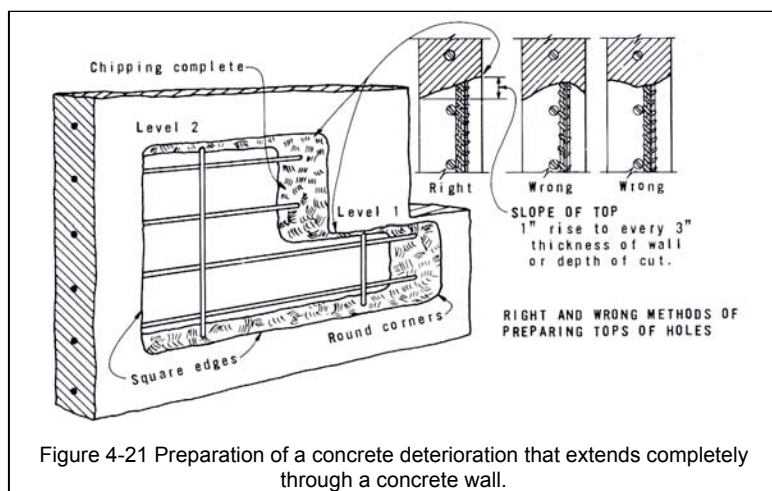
Preparation of a concrete deterioration that extends completely through a concrete wall.
